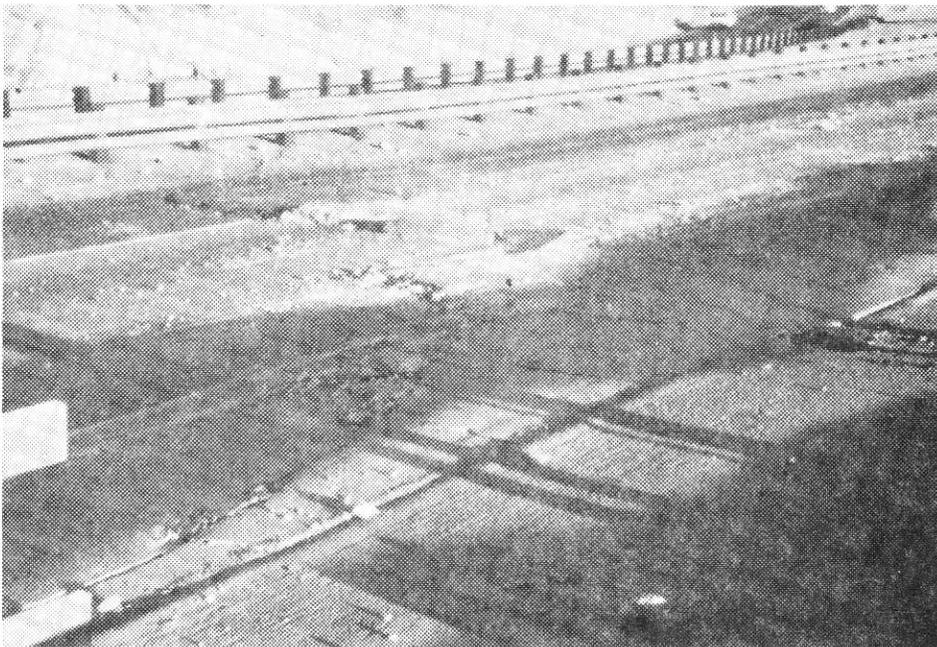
Closer view of pavement damage shown in Photo 74.
